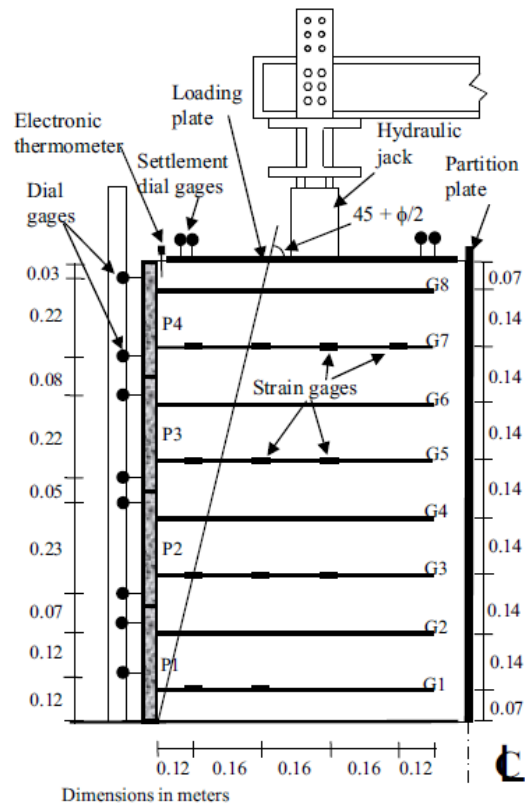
Small-scale MSE wall cross-section (Reddy and Navarrete 2008)
